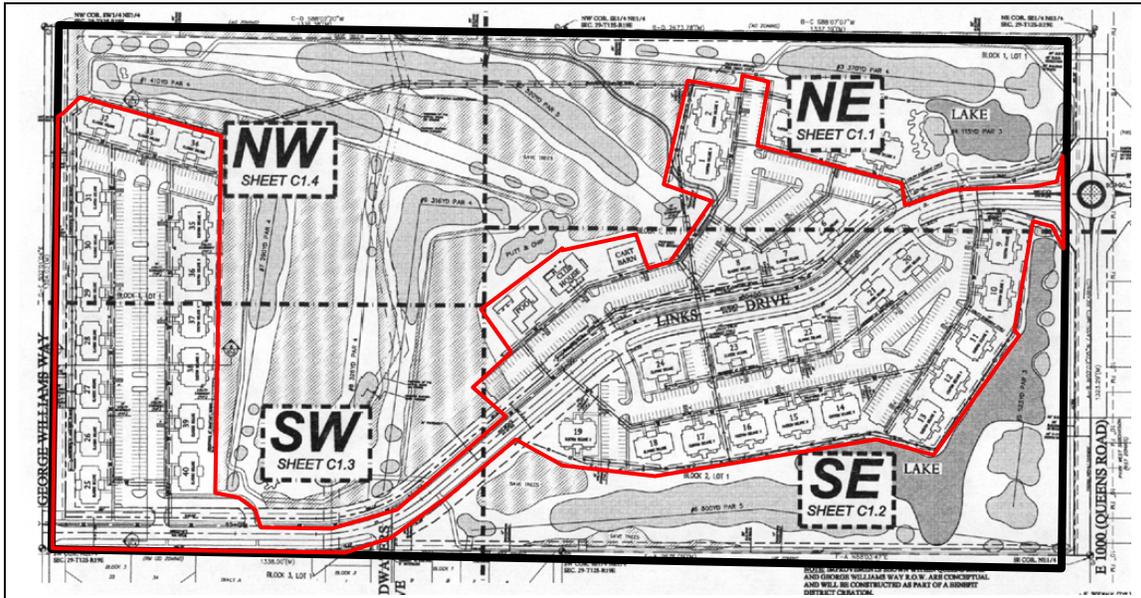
Previously approved PDP with building/parking layout outlined in red.
